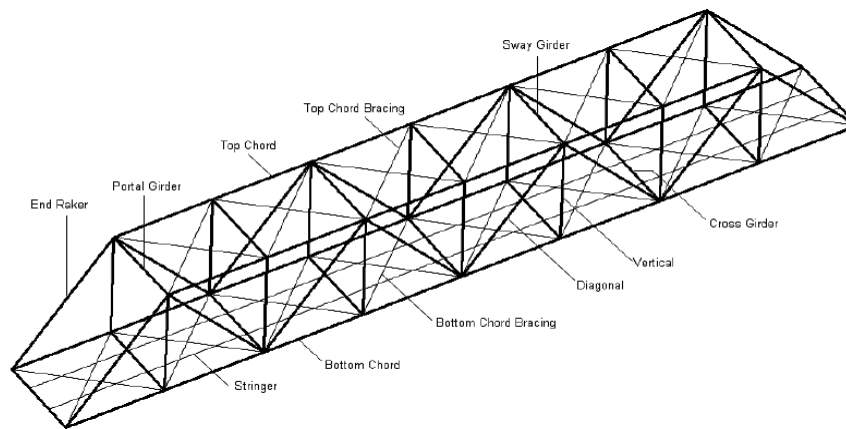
Skeleton of a typical steel truss bridge (Lattice truss)
